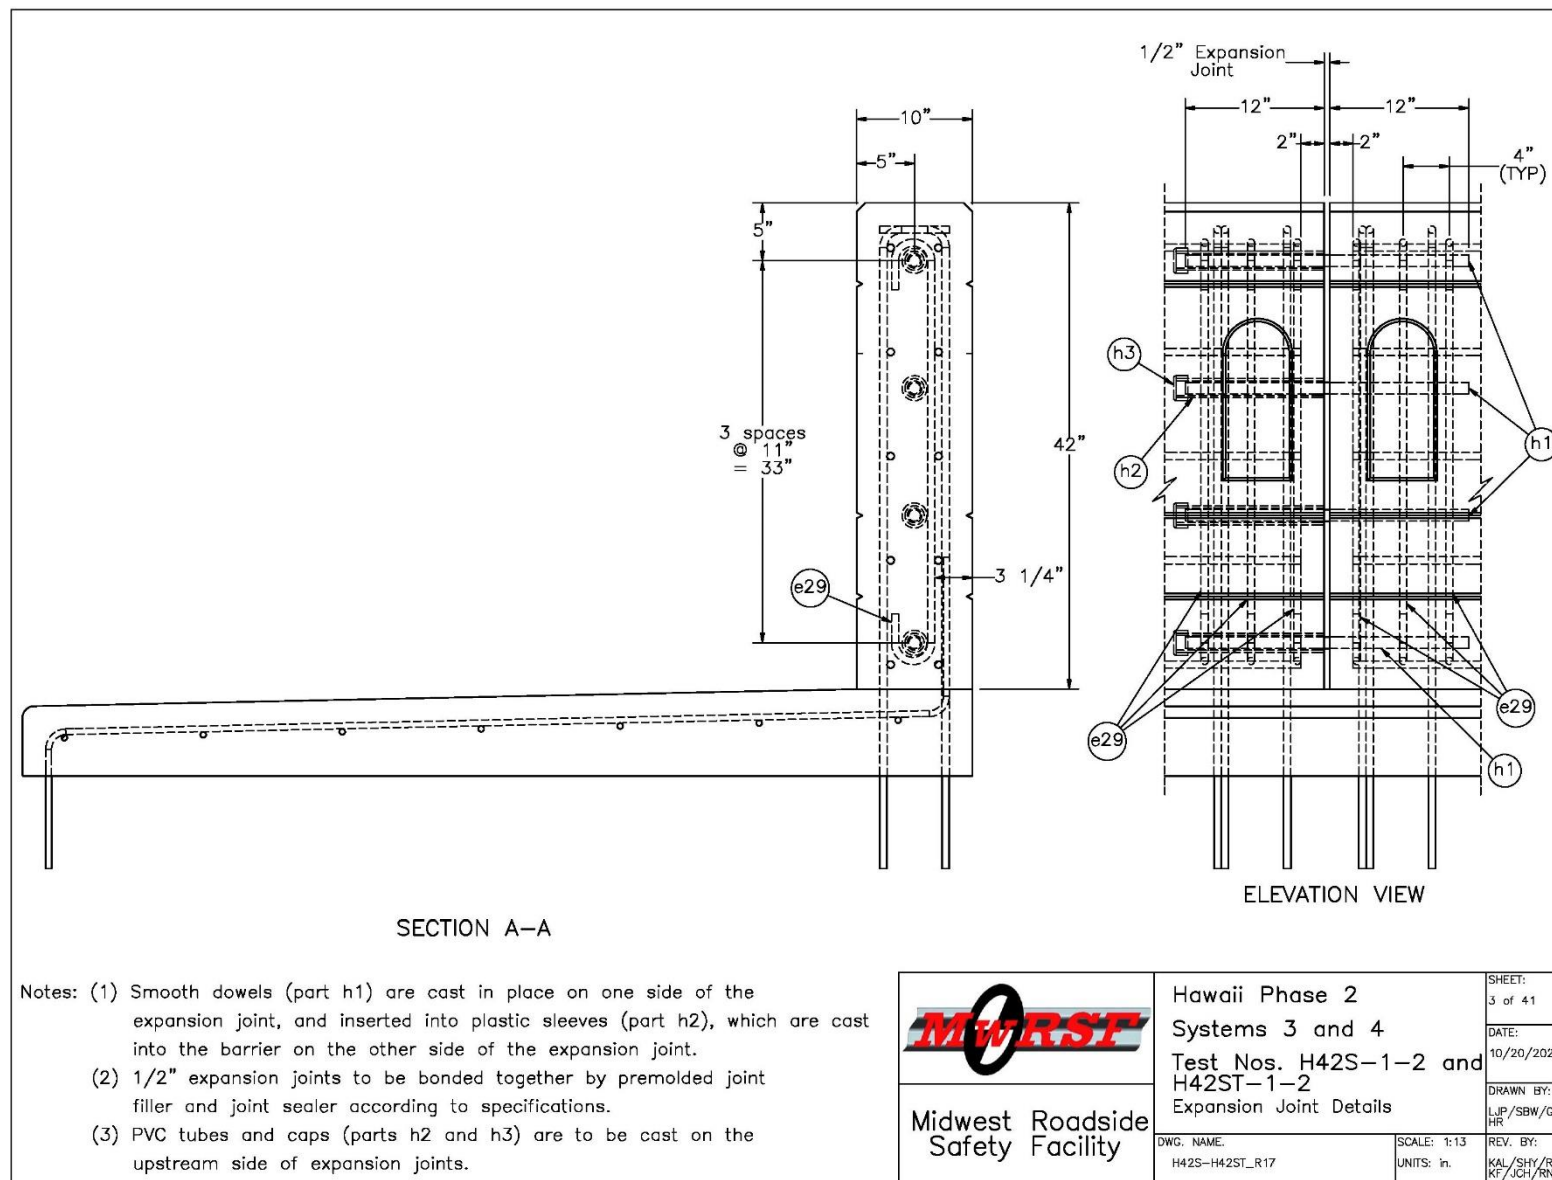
Expansion Joint Details, Test Nos. H42S-1 and H42S-2
